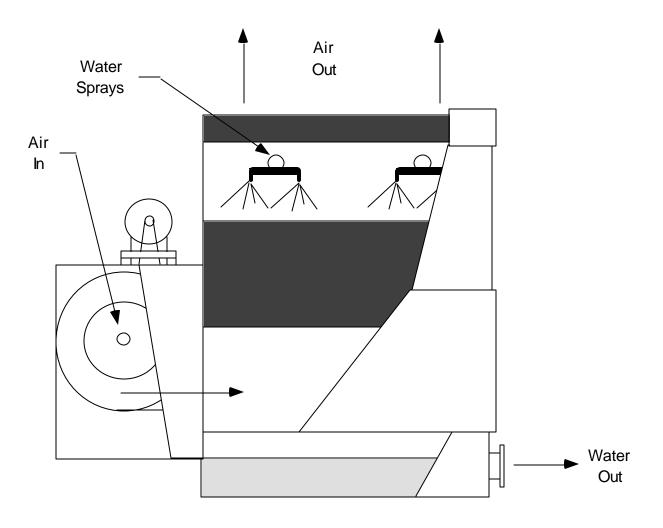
Mechanical Forced-Draft Cooling Tower
